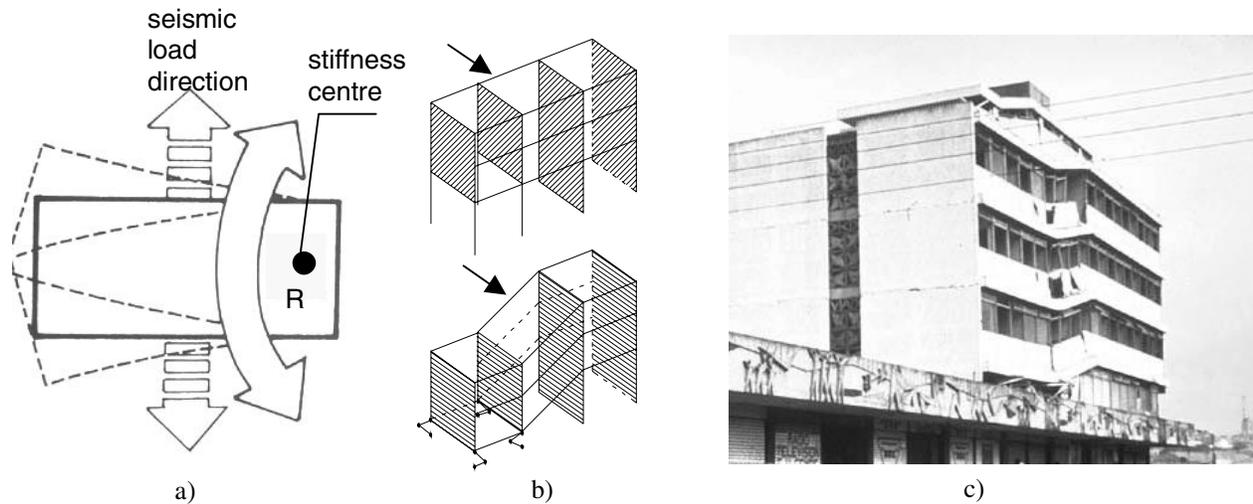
Effect of infills not uniformly distributed in plan: a) plan view: torsional effect ; b) axonometric view: scheme before and after collapse; c) building which has collapsed under seismic action
